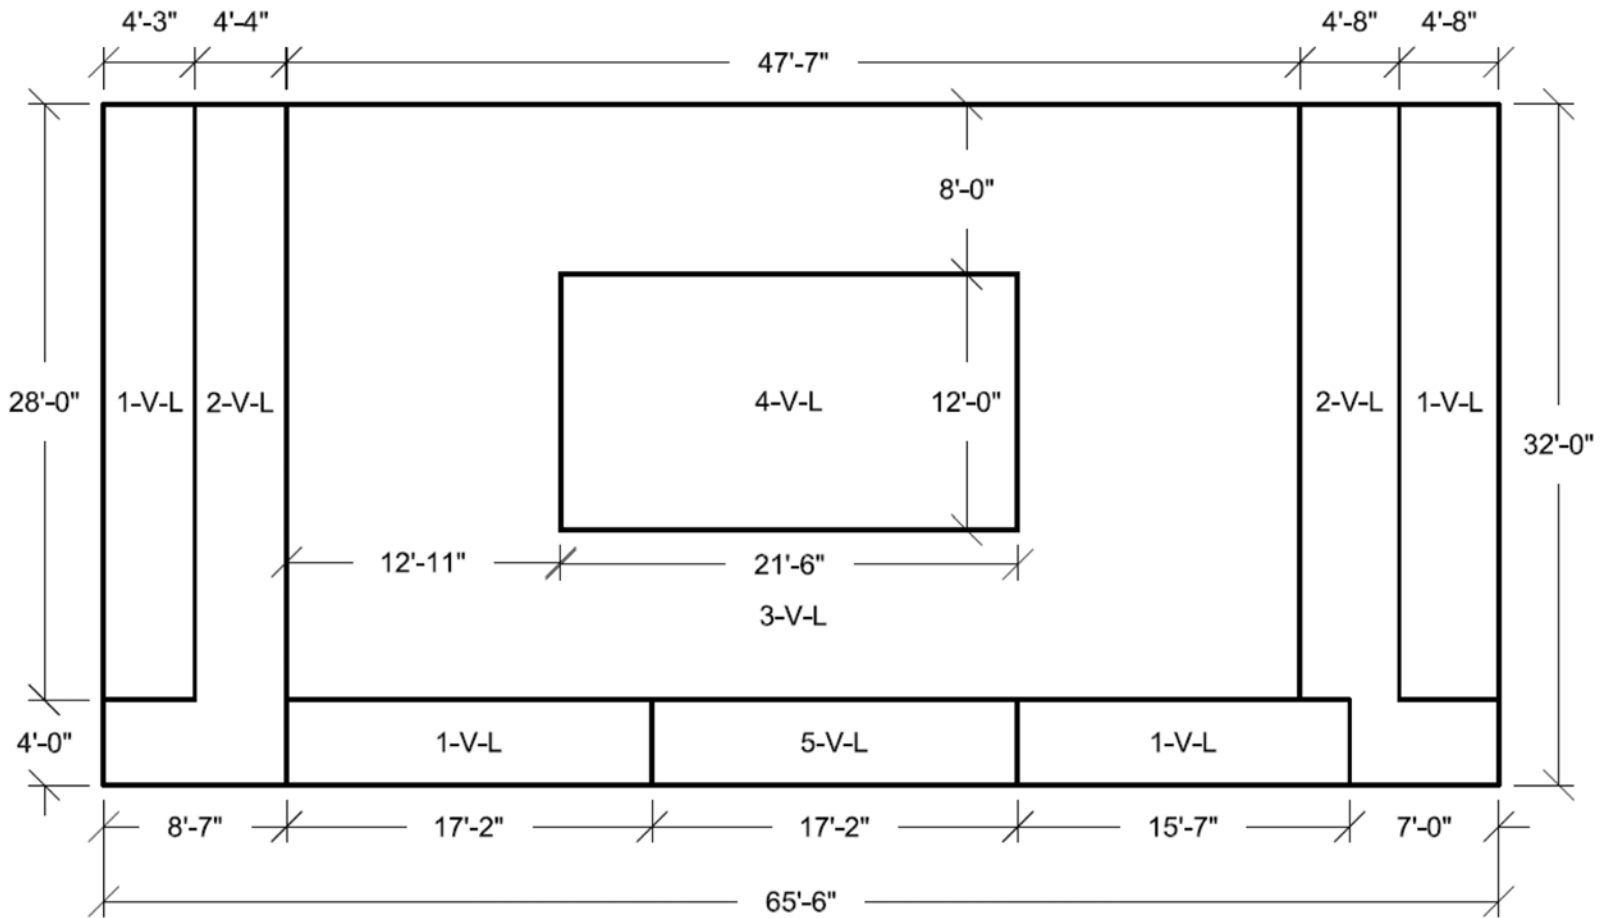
H.6-166 DGFOV Wall 7 Looking From Outside
